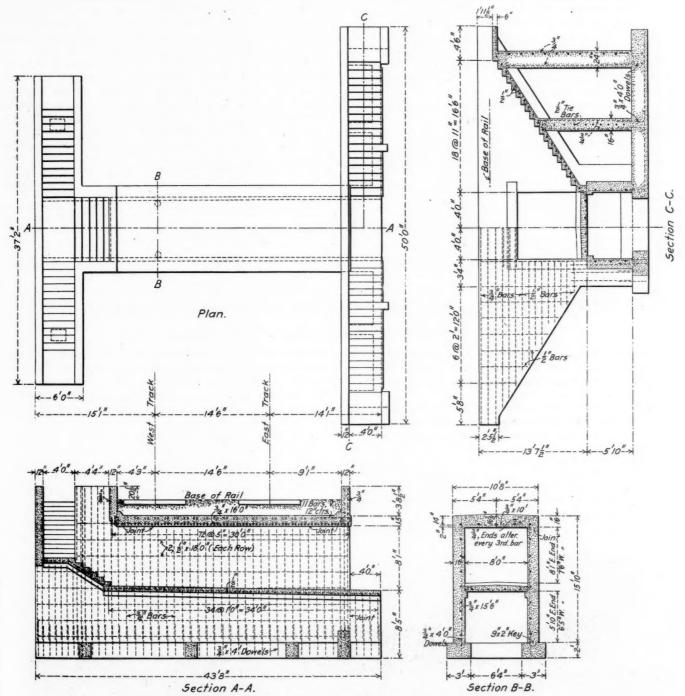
Stair and Station Subway Details; Evanston Track Elevation.
